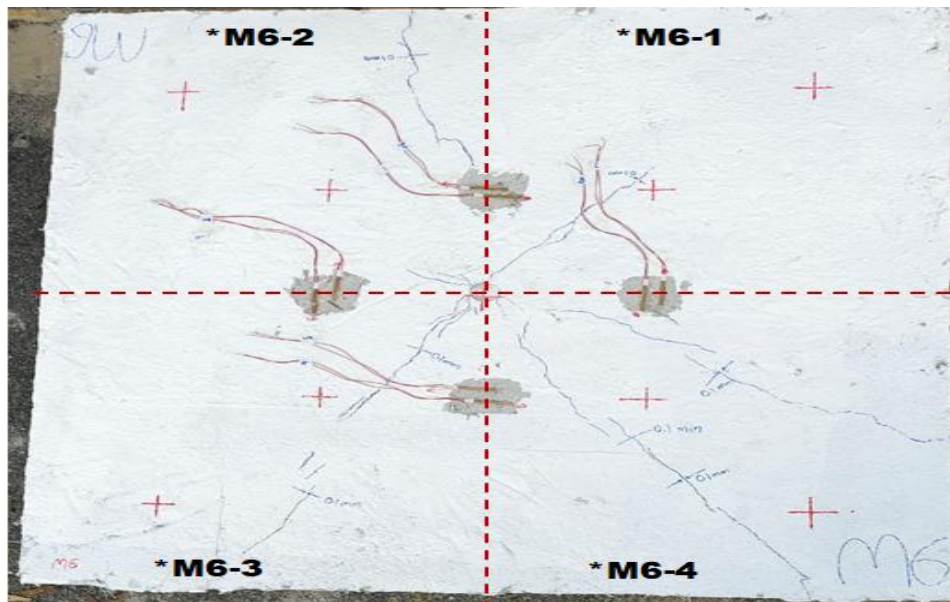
Failure for Slab Specimen M6 (2m drop) – another plan view
